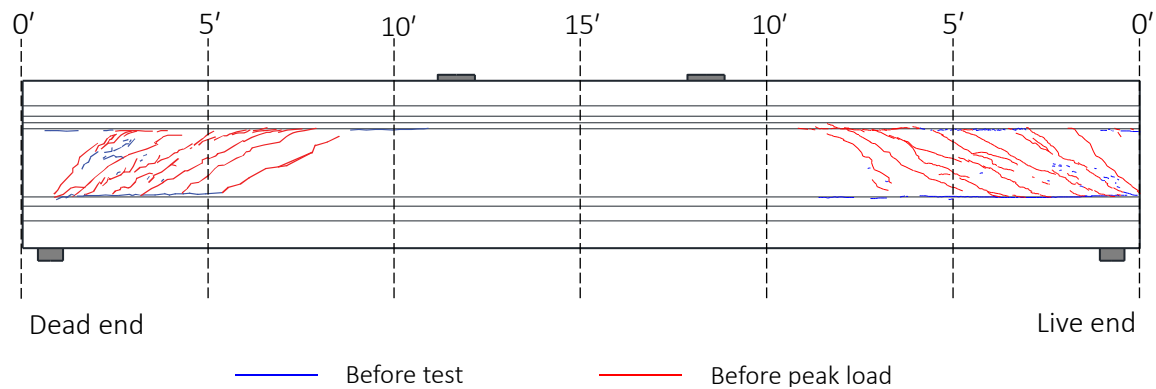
Cracking pattern immediately prior to failure on the east face of Tx46-II
